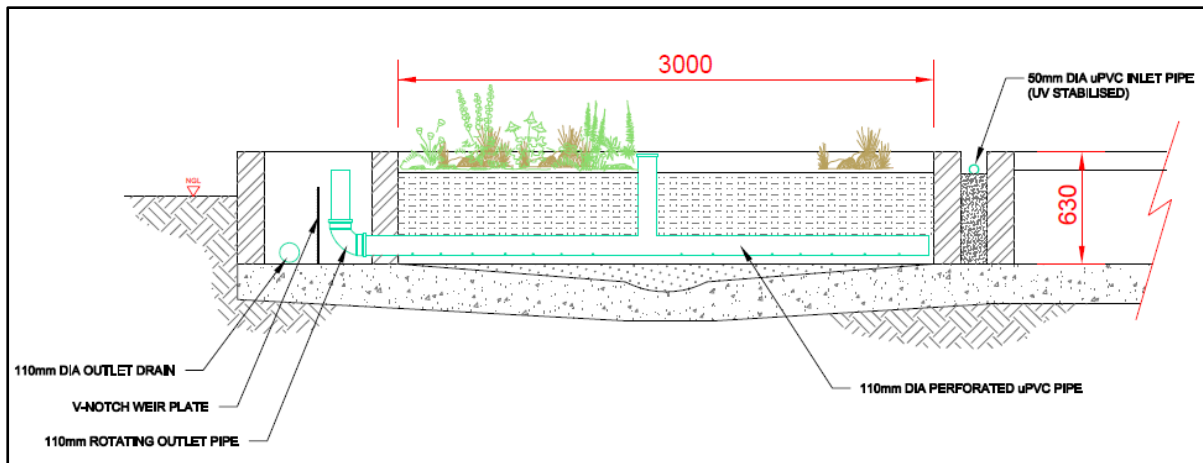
Outlet section detail of the cell (Isidima, 2017).
